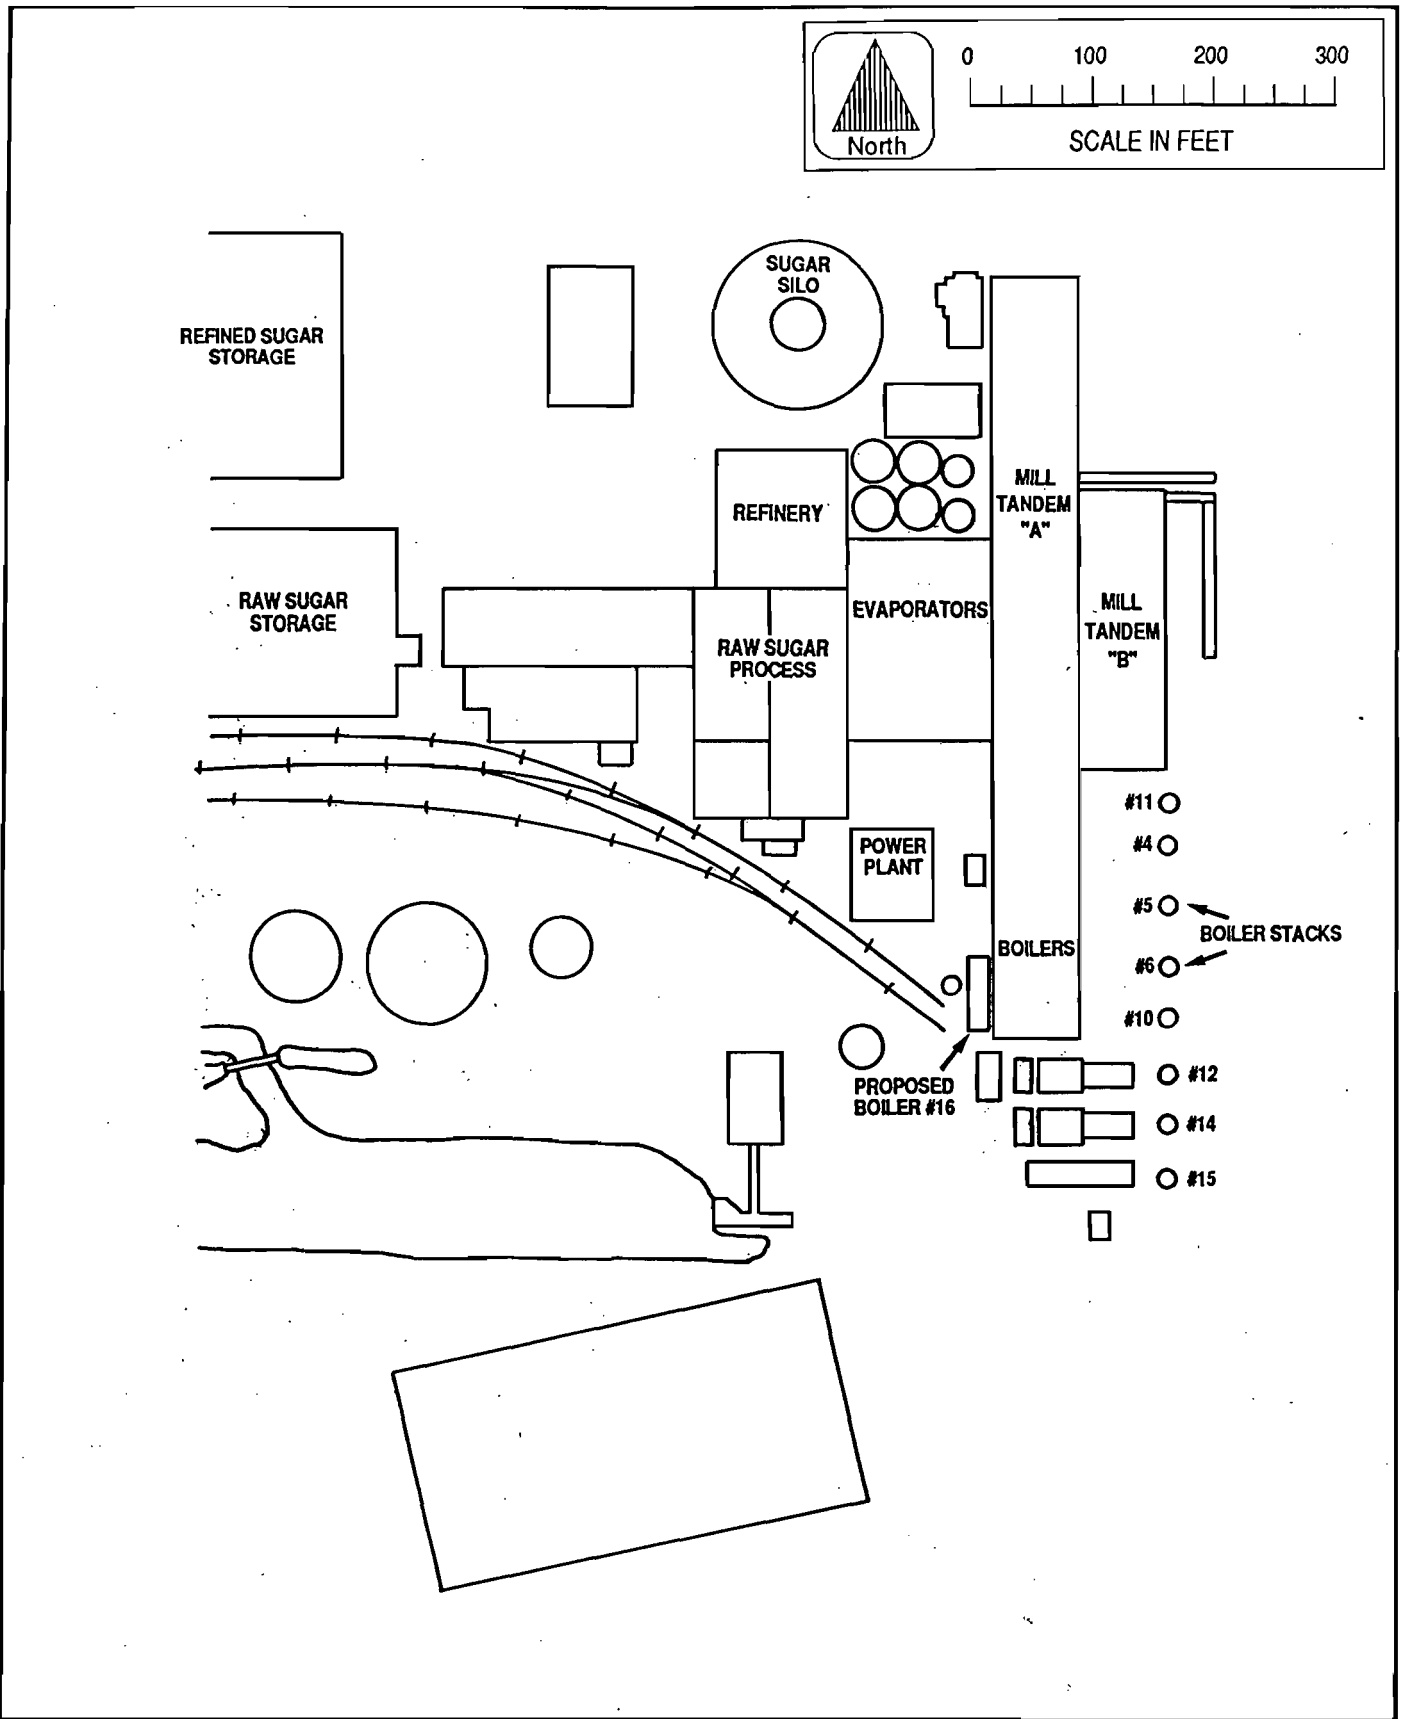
PLOT PLAN OF OKEELANTA SUGAR MILL
